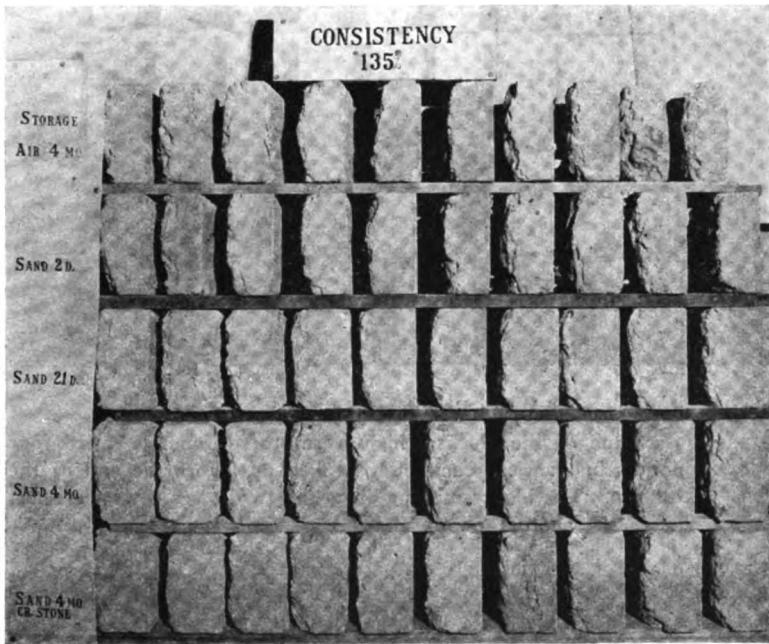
SIDE VIEW OF WEAR BLOCKS AFTER TEST.
